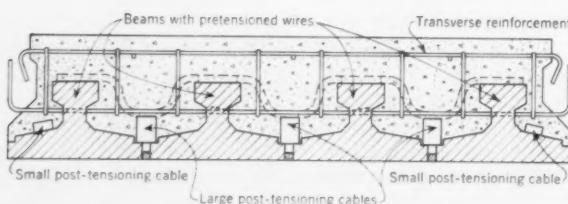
"Wafer" slab for railroad bridge deck is used in Britain for spans of over 60 ft.
